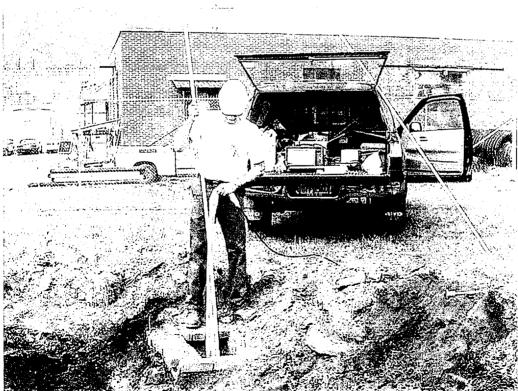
Unknown 12" Drain Line Behind Garage
